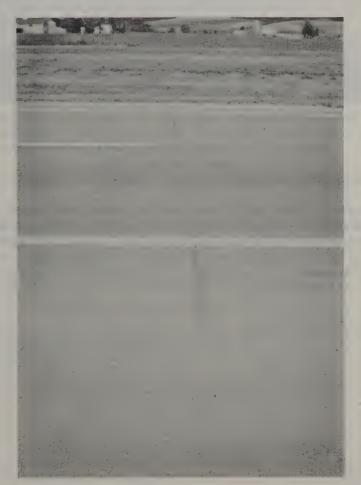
Typical Reflection Crack That Has Developed Over An Underlying PCC Pavement Joint Since Overlay Placement
